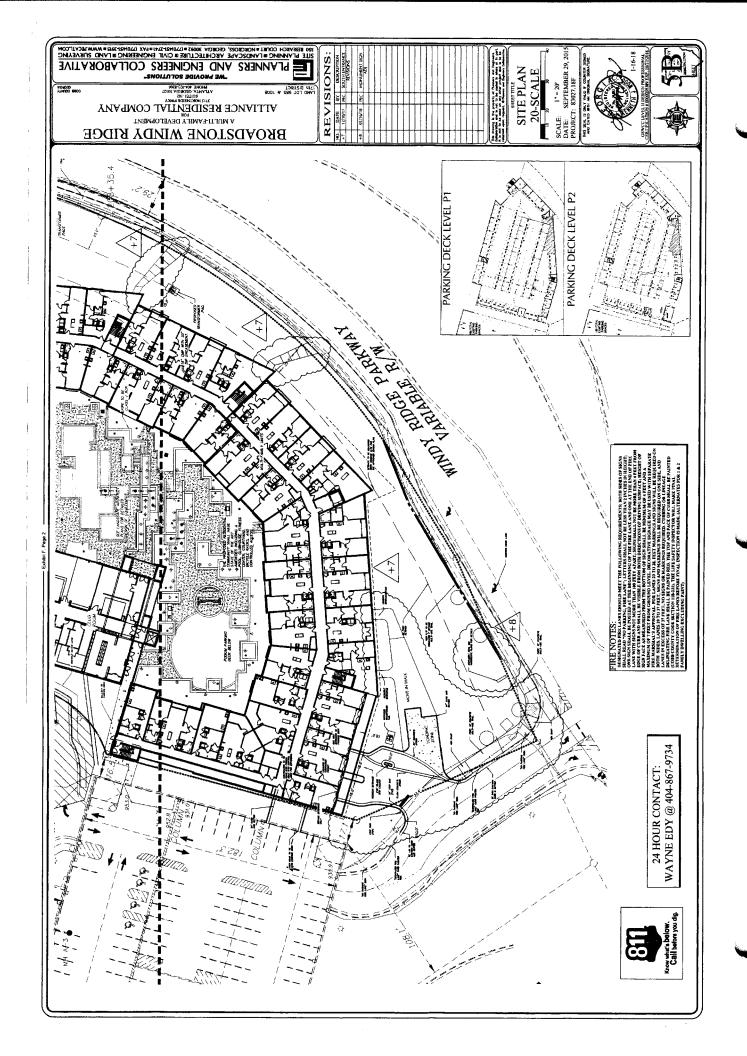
EXHIBIT F: CURRENT SITE PLANS WITH AREA FOR CORNER PARK IDENTIFIED
